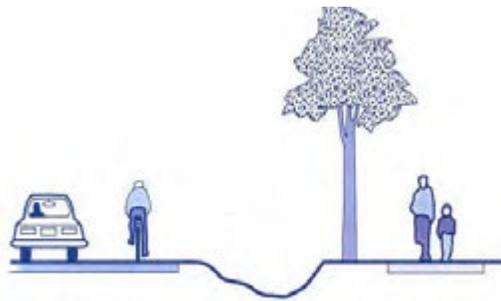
This sidewalk cost little to install without curb (NCDOT)
